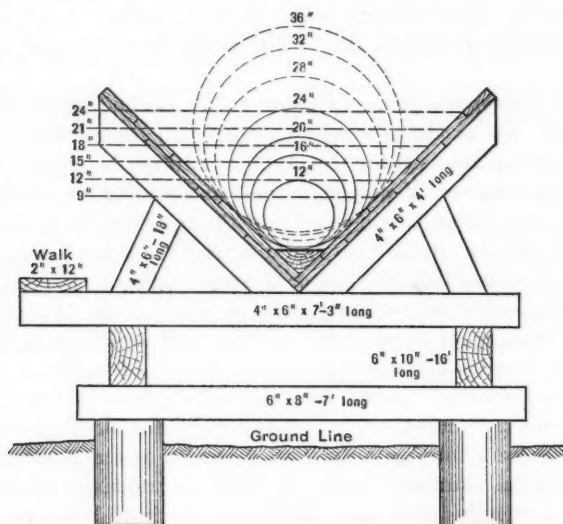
SECTION SHOWING METHOD OF CONSTRUCTING LOGGING FLUMES.
